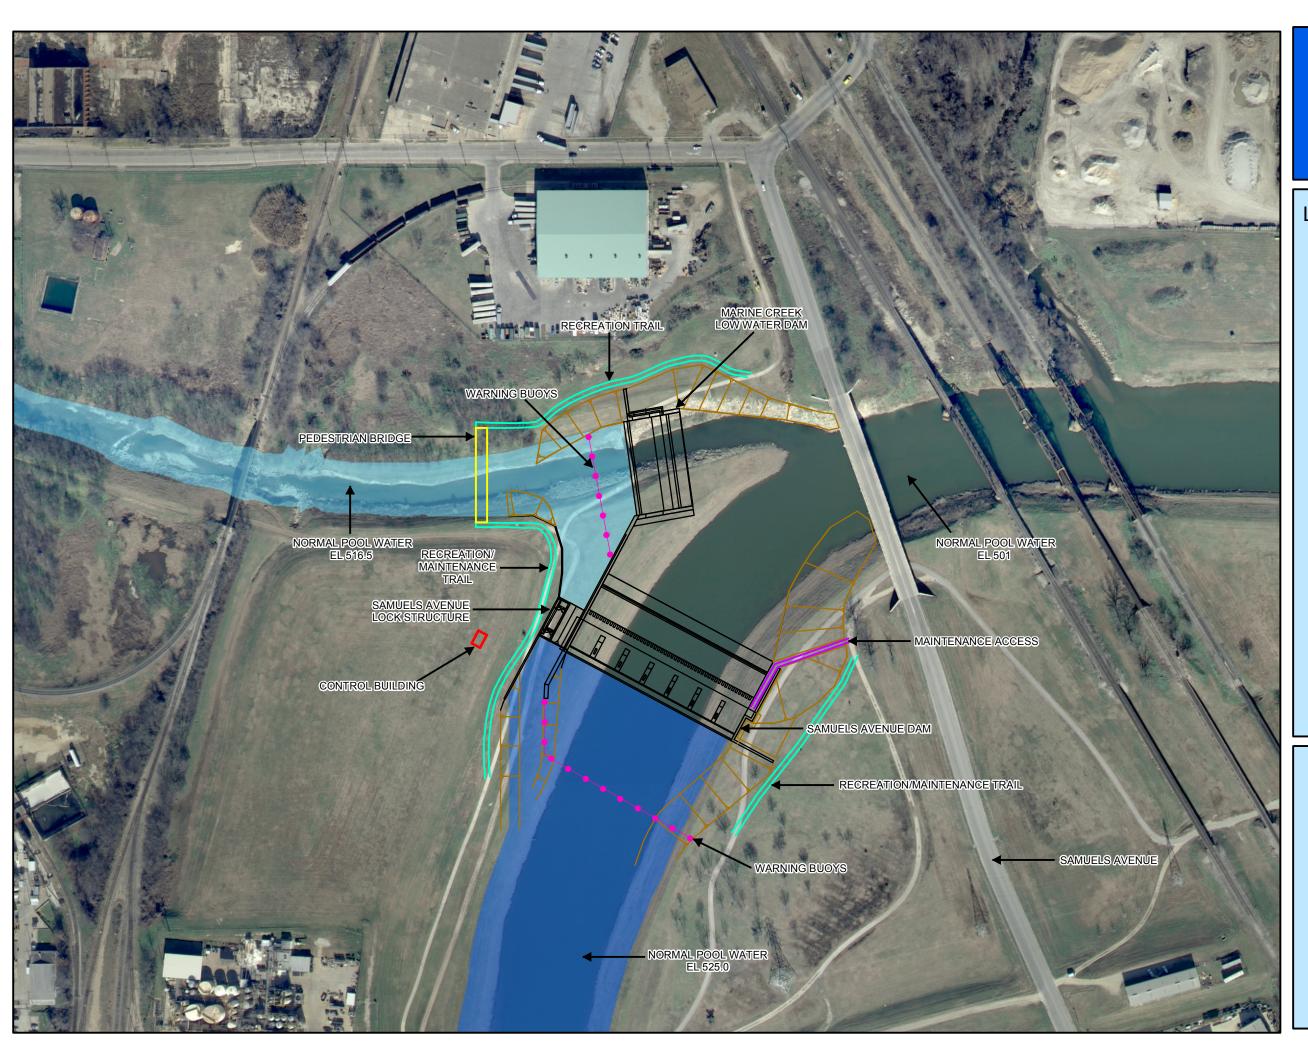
Proposed Samuels Avenue Dam and Site Layout Features
